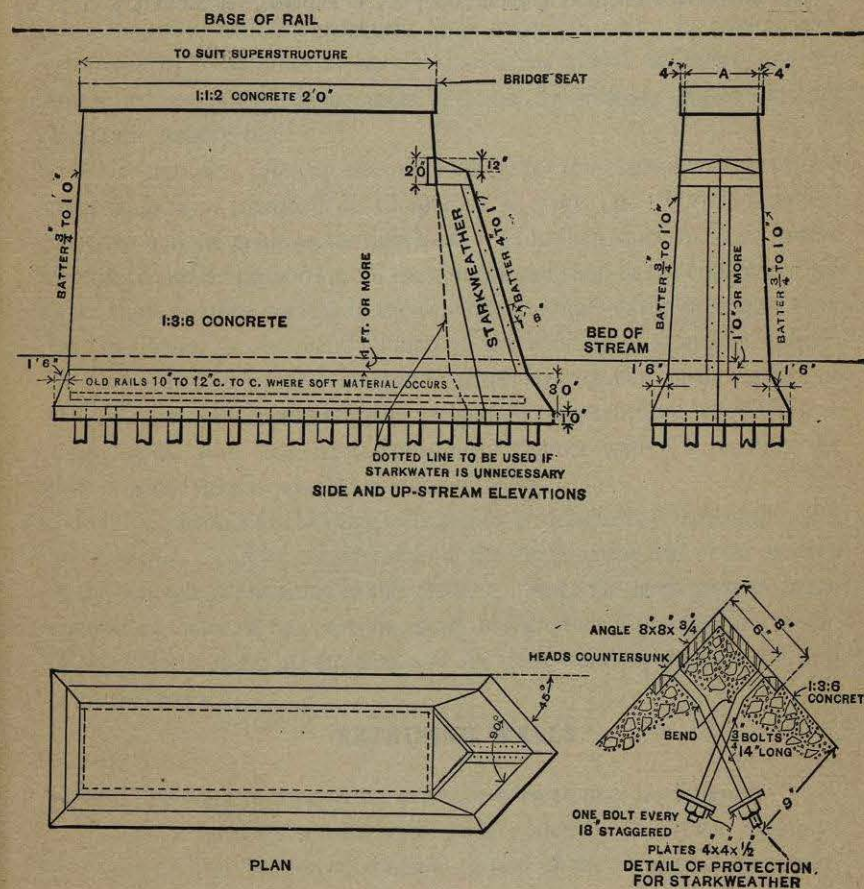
Standard Concrete Bridge Pier, N. Y. C. & H. R. R. R., W. J. Wilgus, Chief Engineer. (See p. 655.)
